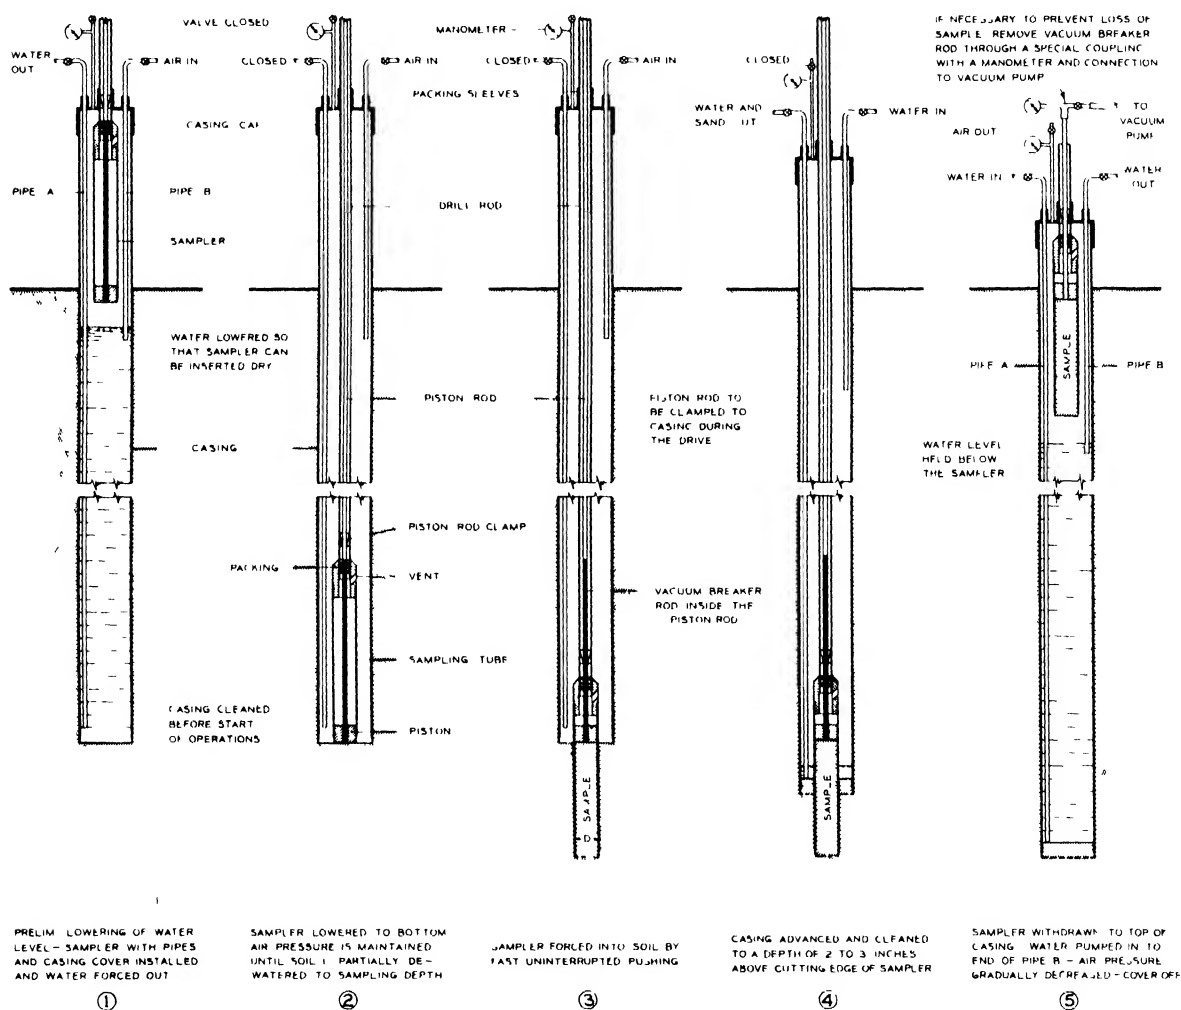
SAMPLING OF SAND WITH COMPRESSED AIR IN THE BORE HOLE
